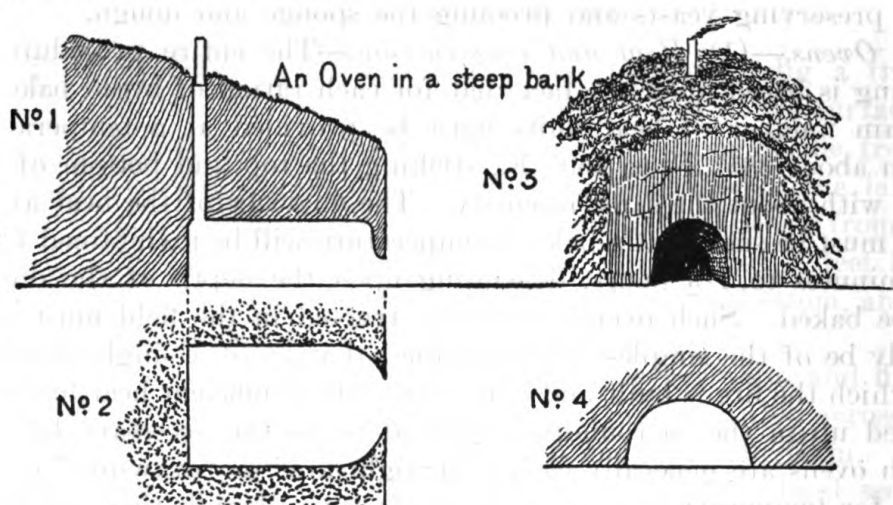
Extemporary oven built in a bank. No. 1, longitudinal section; No. 2, plan; No. 3, front view (not on the scale); No. 4, transverse section of interior.
